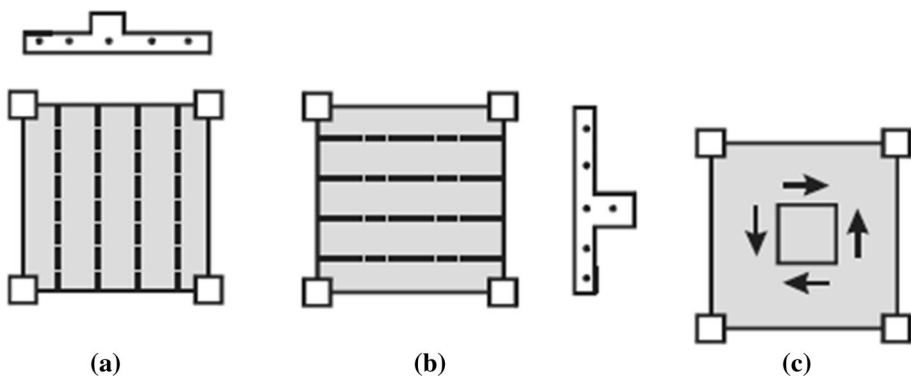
Parallel layers used in PERFORM-3D for modelling of concrete walls (CSI 2006). a Vertical axial/bending, b horizontal axial/bending, c concrete shear
